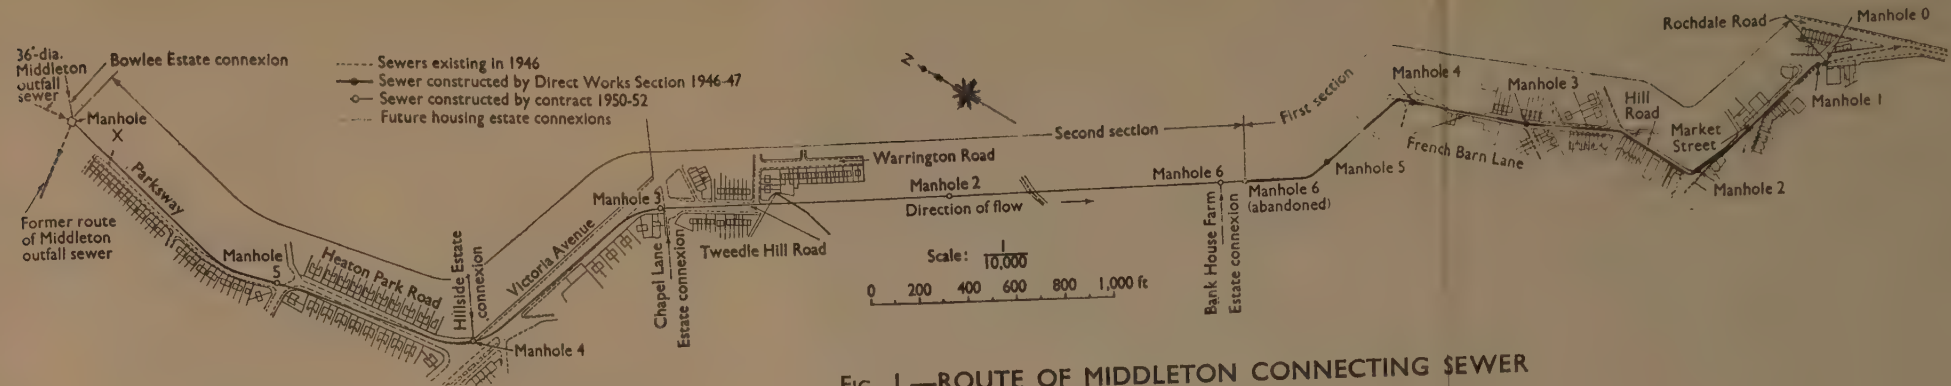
ROUTE OF MIDDLETON CONNECTING SEWER
